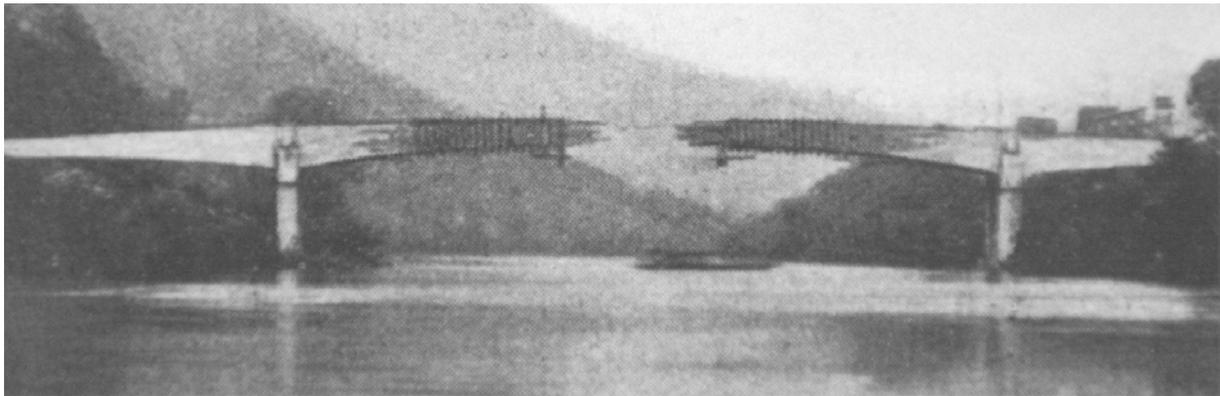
First reinforced concrete bridge built using the cantilever construction method over the Rio de Peixe in Brazil, Emilio Baumgart, 1930. (Deinhard)
